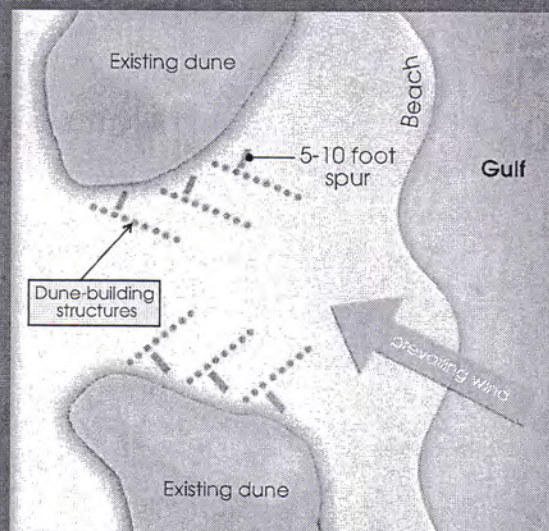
Placement of dune-building structures in washovers or washouts that do not extend across the barrier island.
